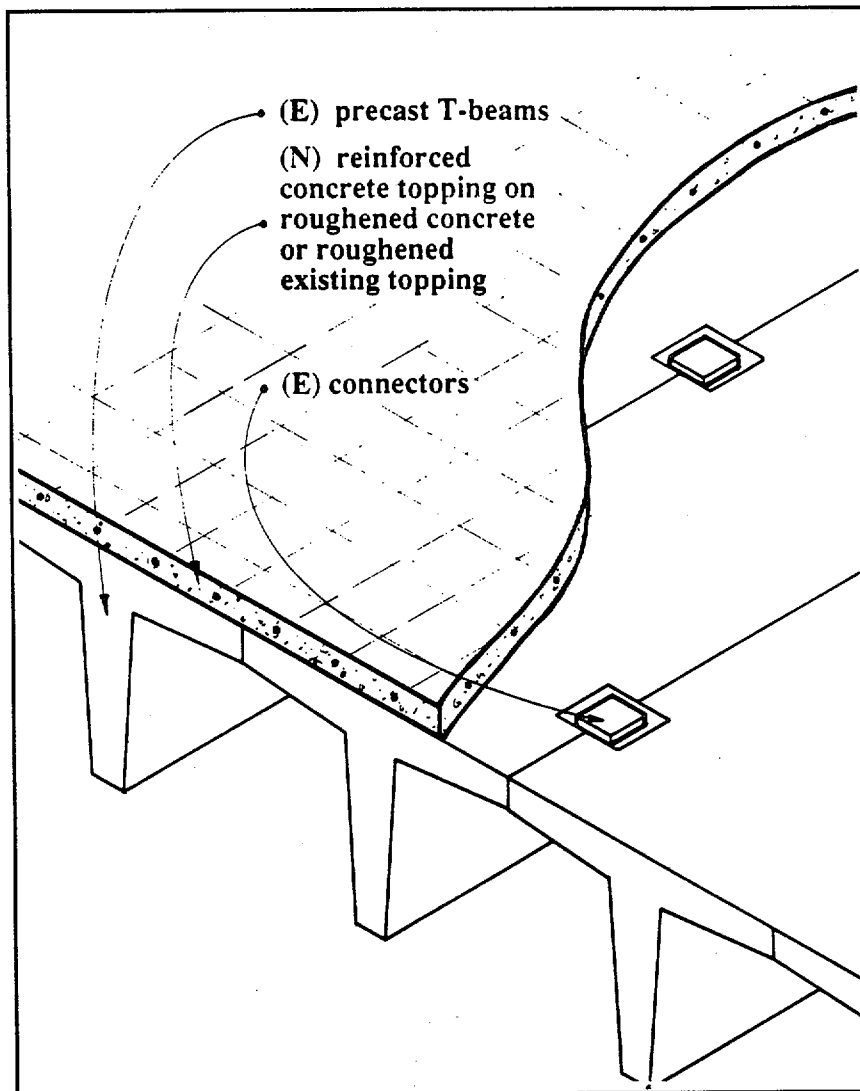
Strengthening an existing precast concrete diaphragm with a concrete overlay.
